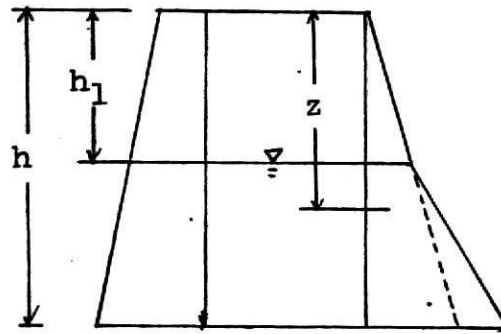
Retaining wall with vertical back and partly submerged backfill
